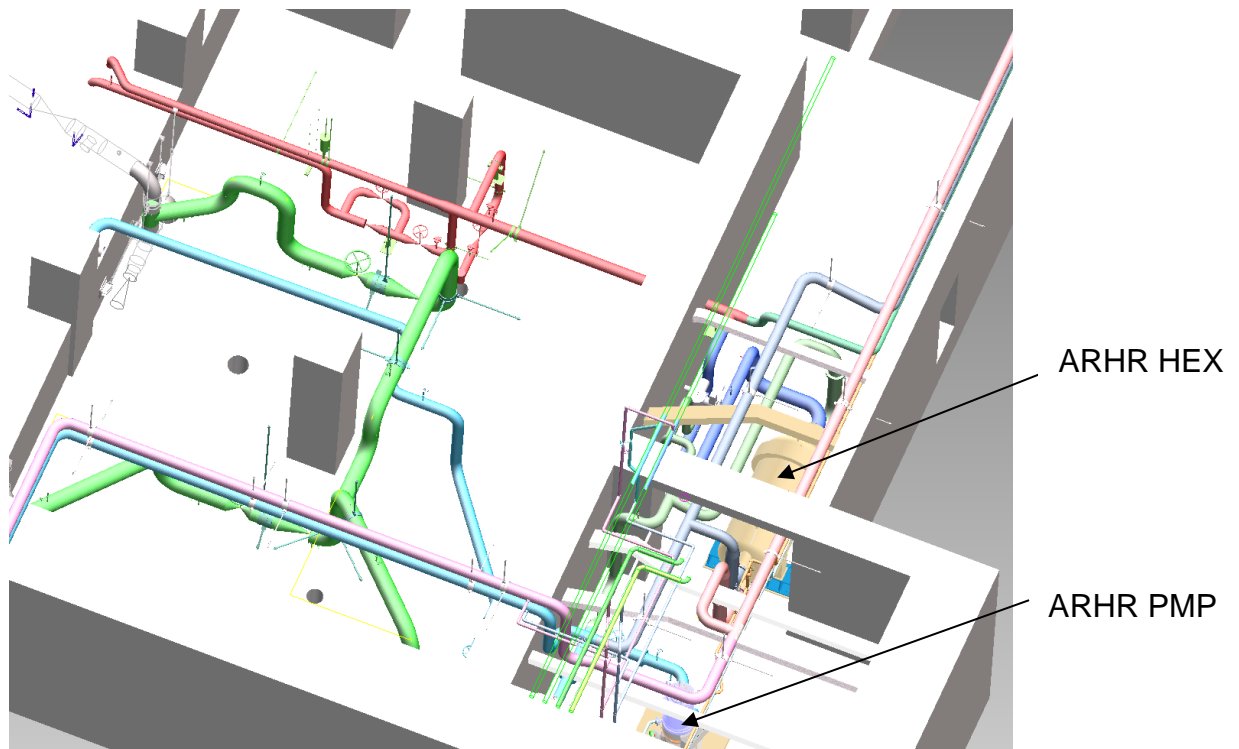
Ground plan of the AB el. 89, showing new piping (colour) and major equipment (PMP, HEX) – look from plant west side
